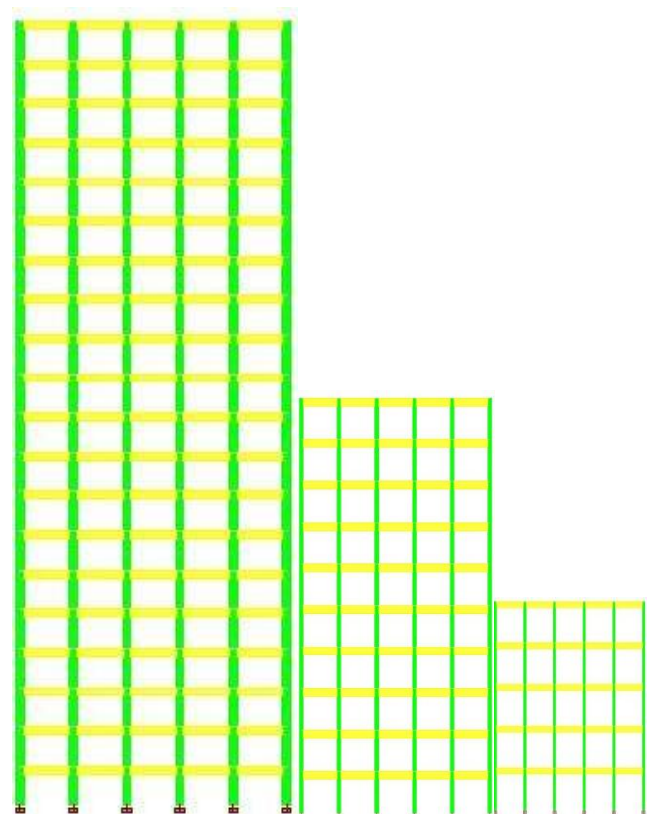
Typical elevation of 20-storey, 10-storey and 5-storey models
